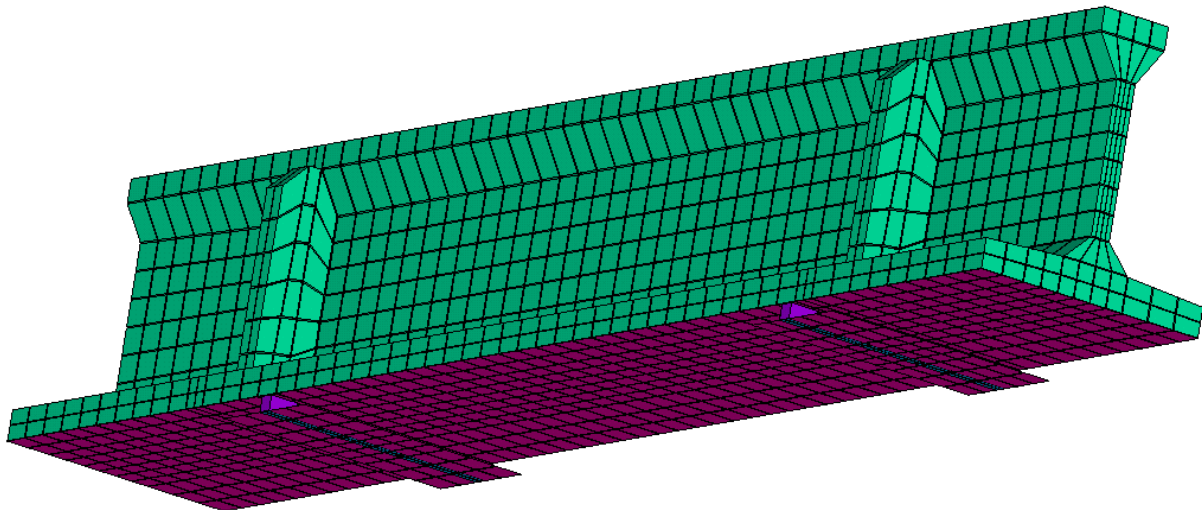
Connection between additional dead load and test beam by surface contact elements
